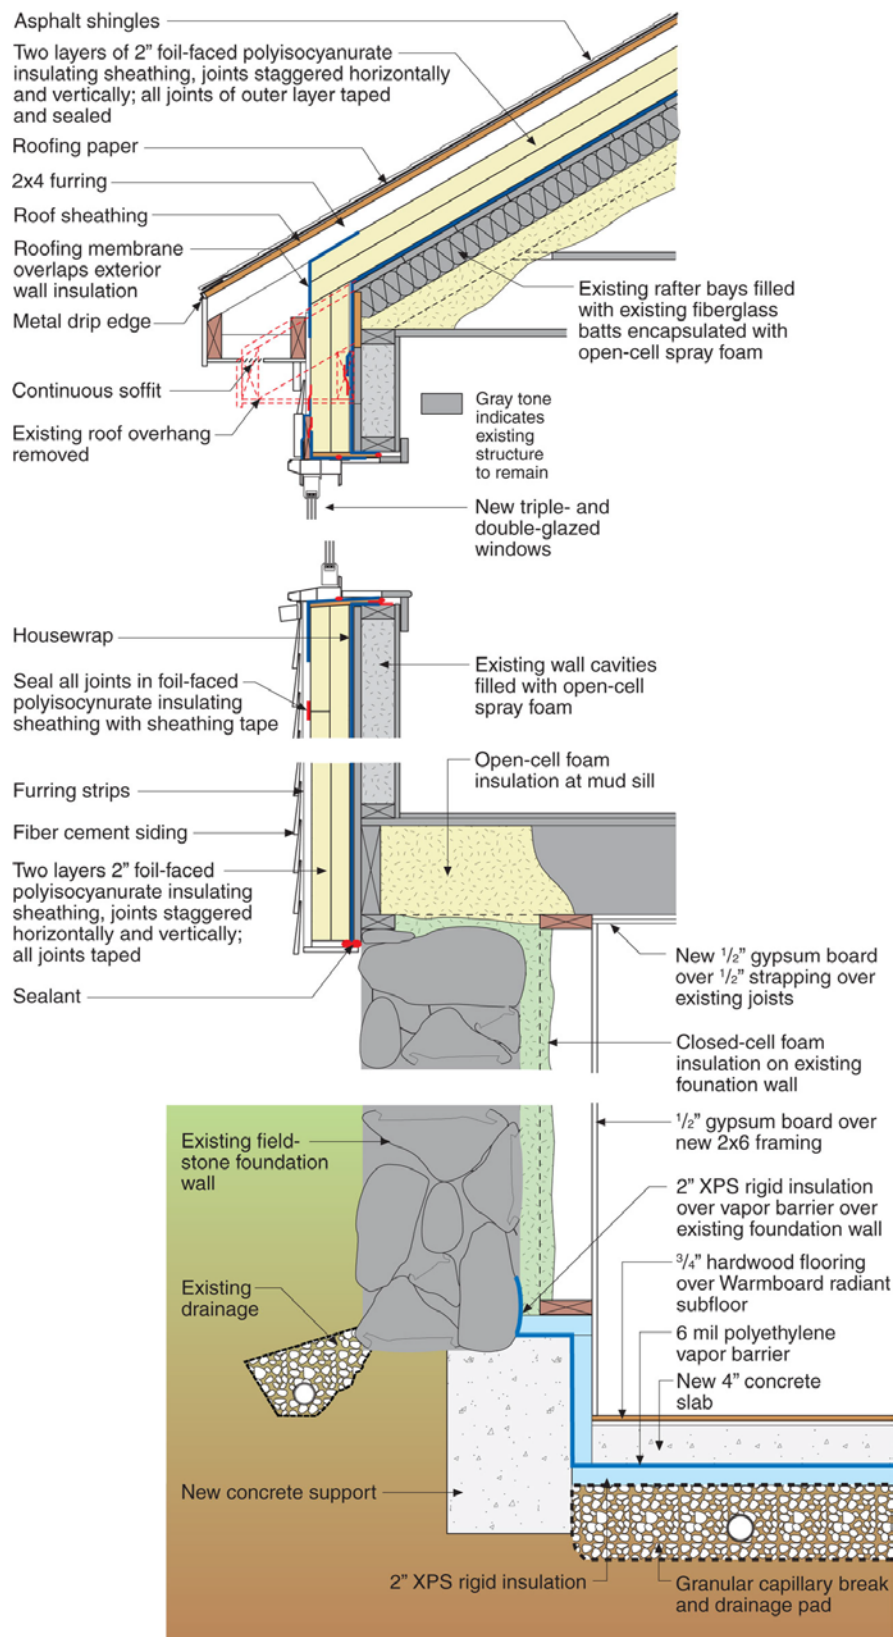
Schematic wall section for Test Home 4 enclosure retrofit strategy
